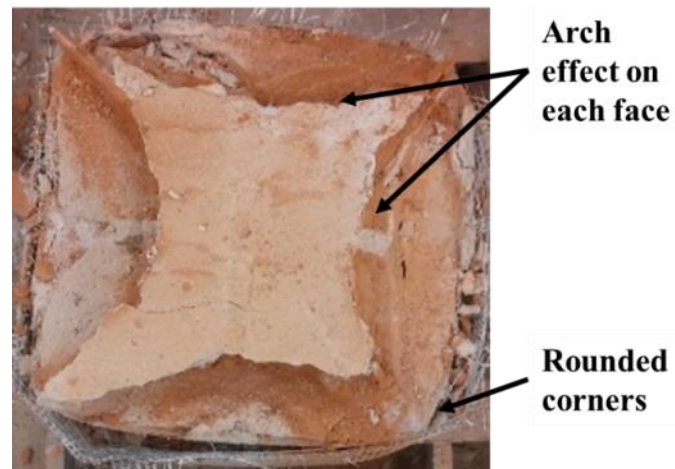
Cross Section of Column Showing Symmetric Arching Effect and Crushed Column Corners
